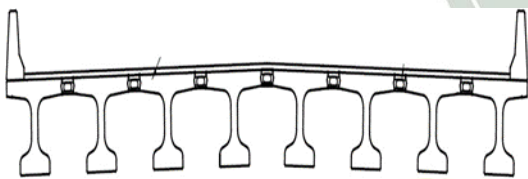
Typical Decked Bulb Tee girder bridge cross-section (PCI Northeast)
